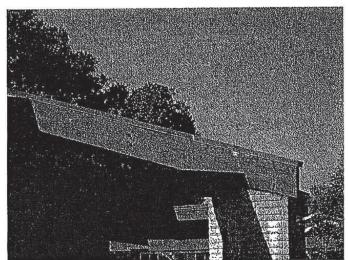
~ Park View - Kindergarten, exposed Gulam beams need water proofing paint
